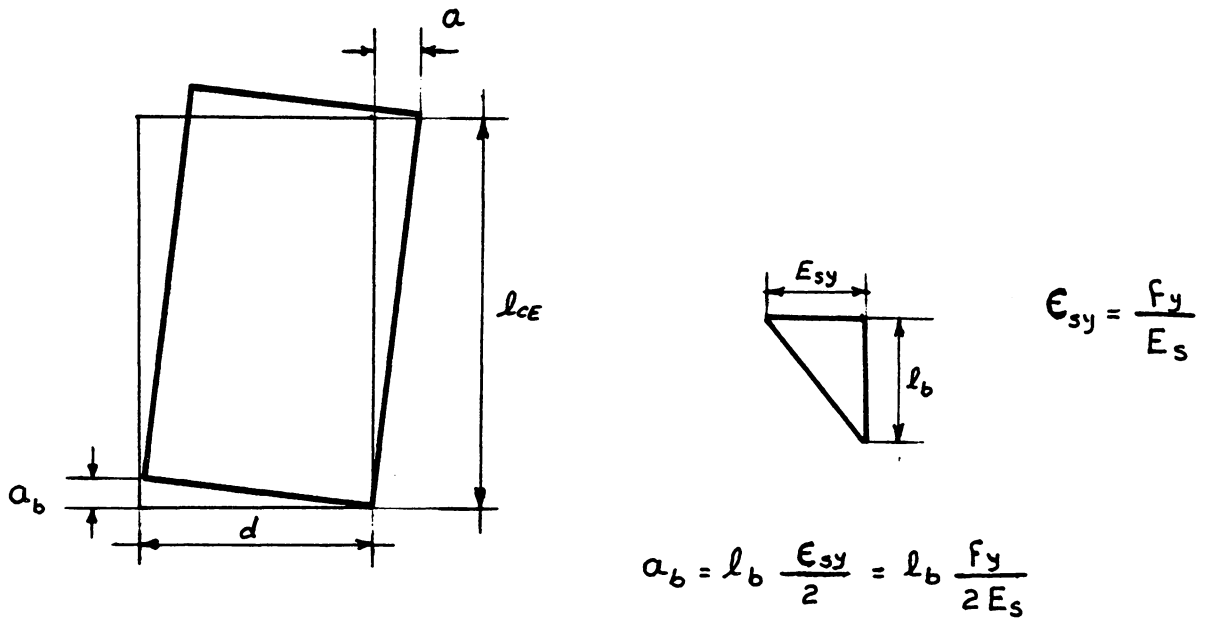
Slip of the Reinforced Concrete in the Tension Column.
